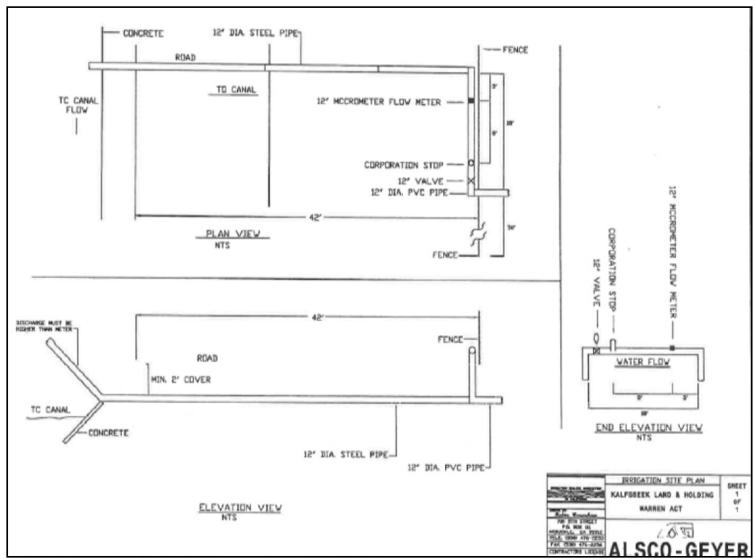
Cross-sectional view showing pipeline placement and elevations.
